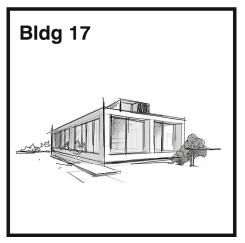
Building Type 17: Sketch of a stand-alone house — new building. Data on the characteristics of the building are given in the extended final report.
